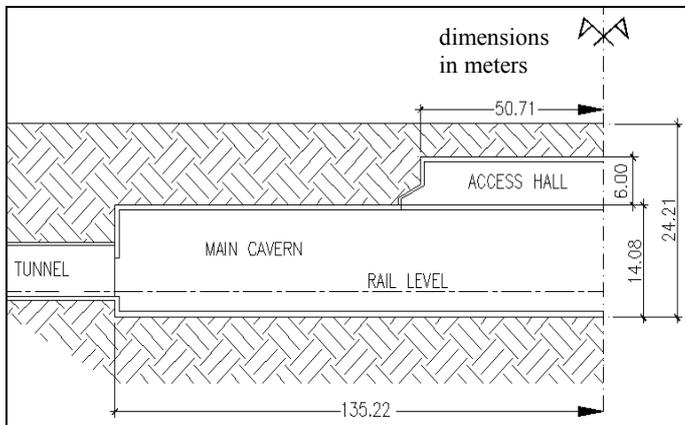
Longitudinal sketch of Corrientes Station, Line H.
